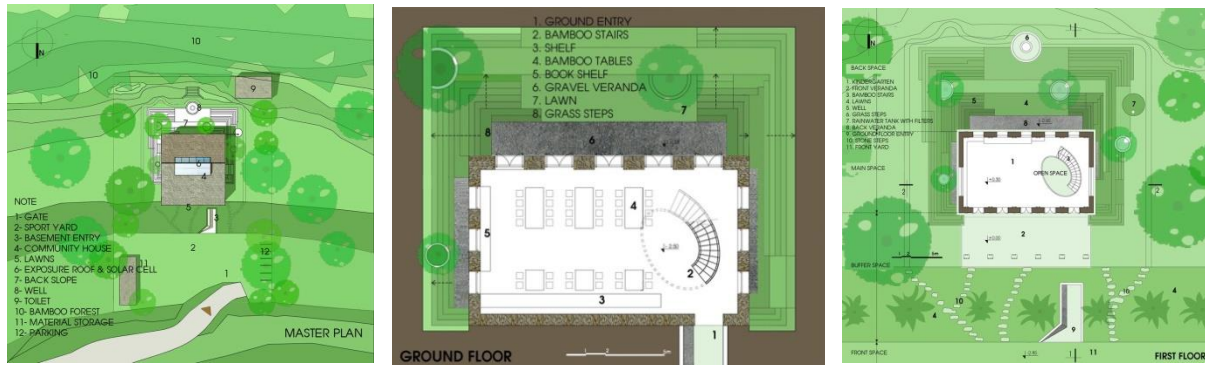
1. Master Plan of the Community house, 2. Ground Floor Plan of the Community house, 3.
